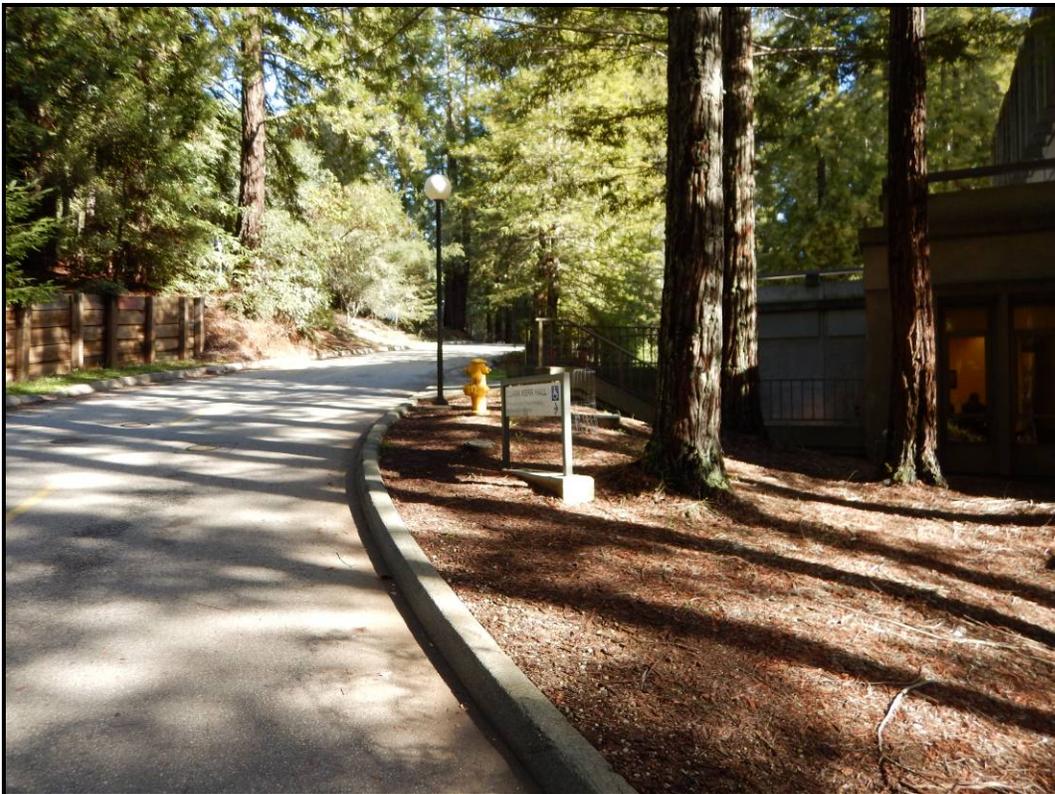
Utility route between pedestrian bridge and Clark Kerr Hall.
